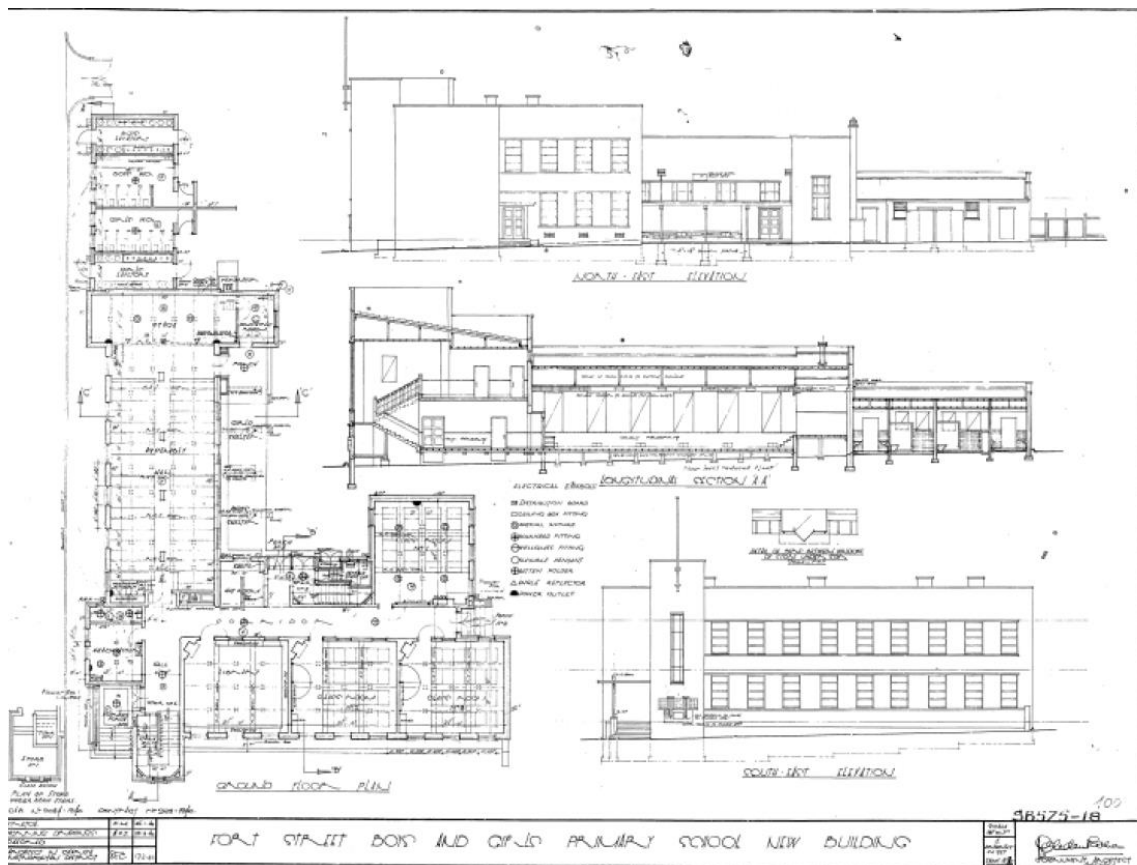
Drawing prepared in the Government Architect's office describing the ground floor plan, north east and south east elevations and a longitudinal section through the building. (Source: Finance & Services Information Services, drawing SB575-18.)
